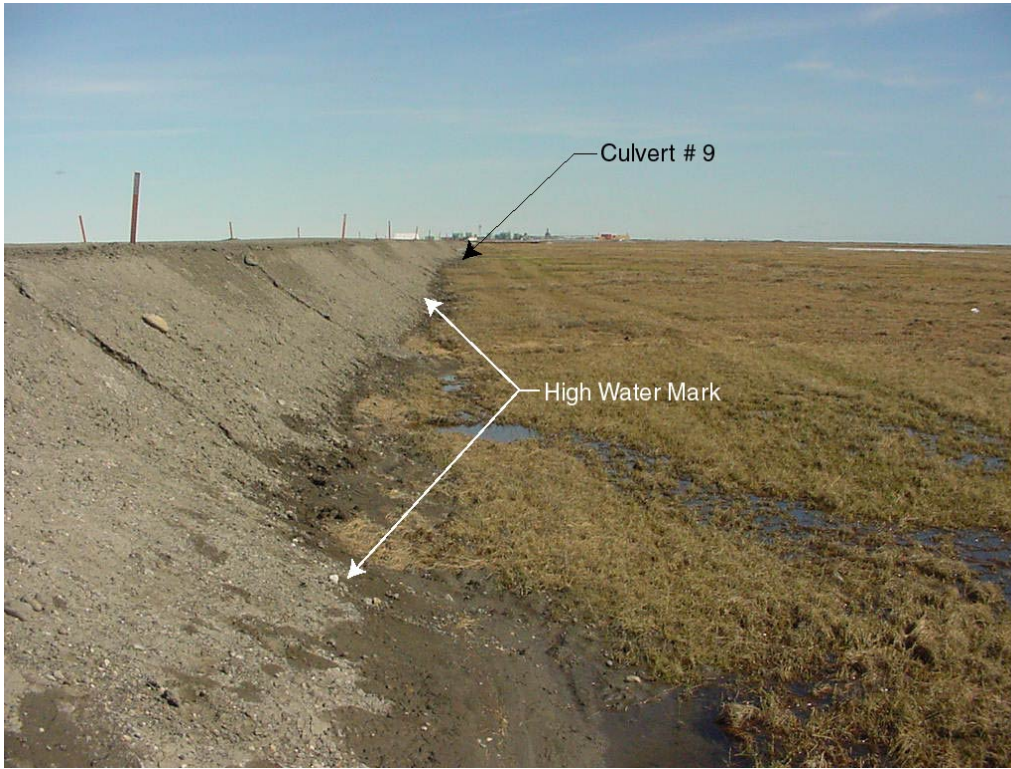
Facing east from Culvert #10 along the north side of the CD-2 access road. (6/15/01)
